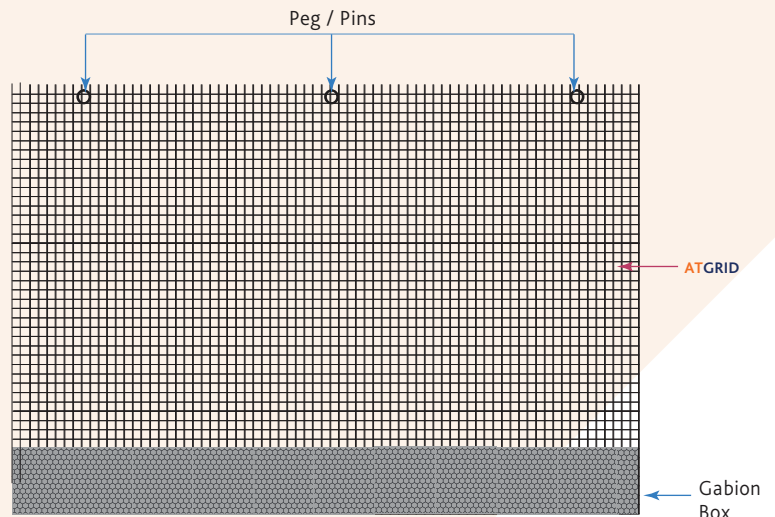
A Plan view of RS Wall with Gabion fascia & ATGRID
